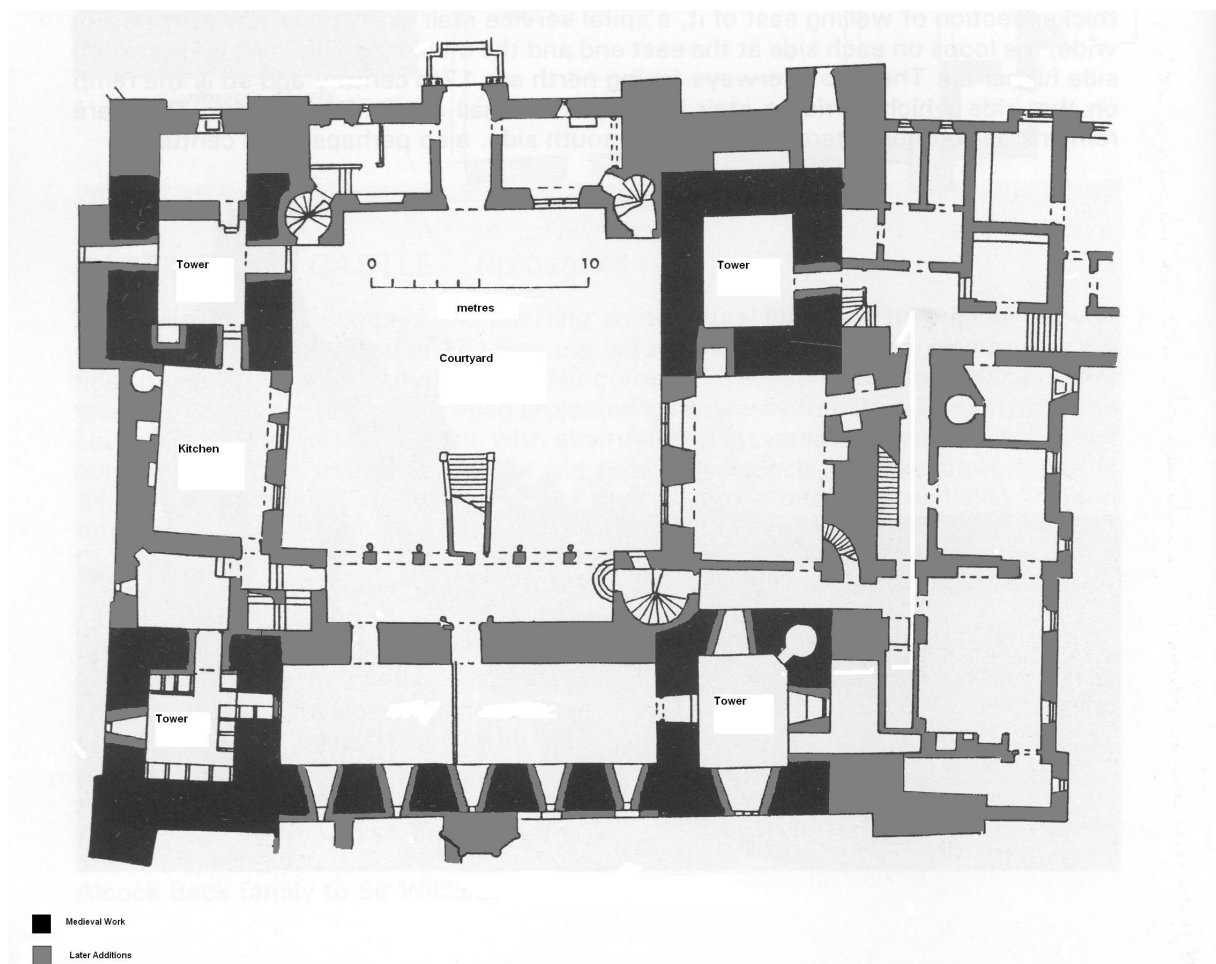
Floorplan of Chillingham Castle, M. Salter, *The Castles and Tower Houses of Northumberland*, 34.
